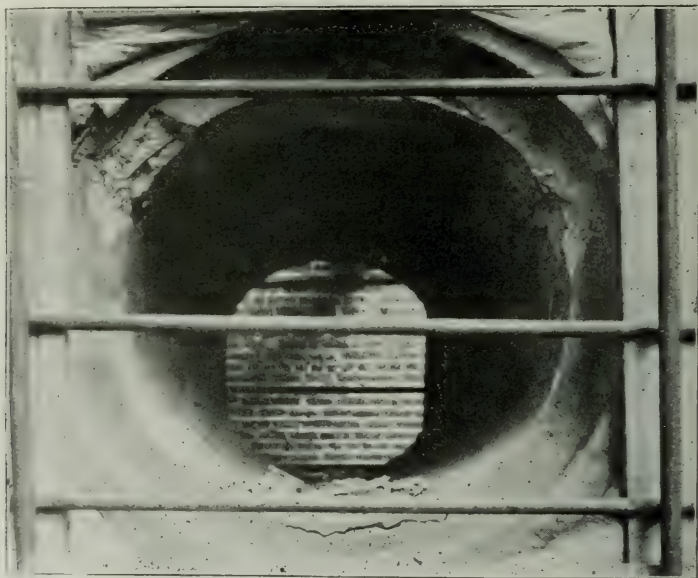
View of Reinforced Concrete Pipe After Test.
